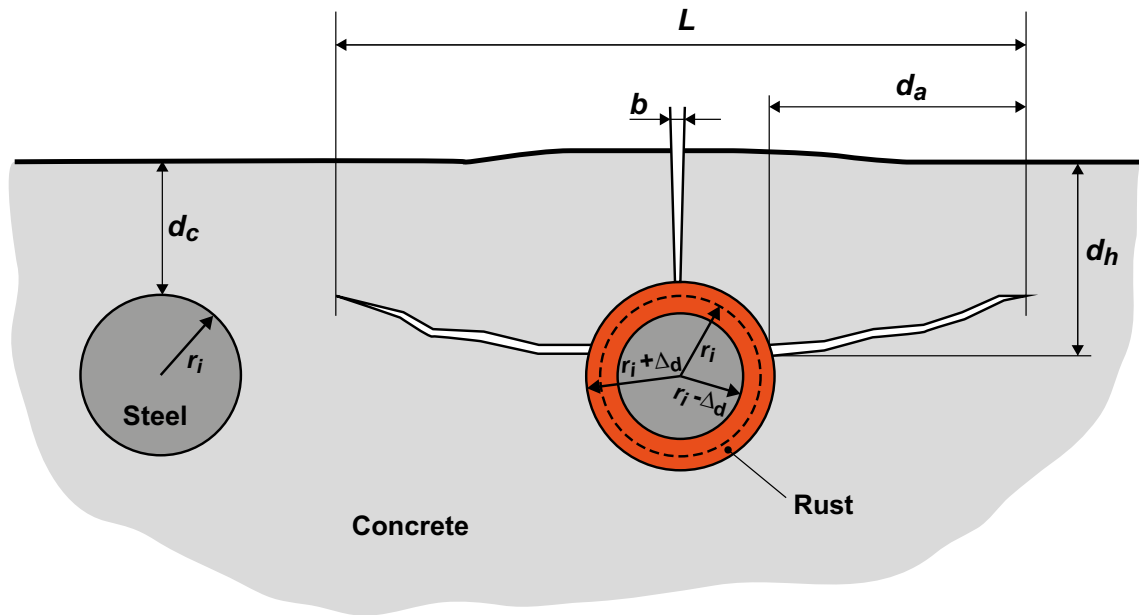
Illustration to formation of horizontal and vertical fractures in concrete constructions due to corrosion of reinforcement bars, modified from Benin et al. (2010).
